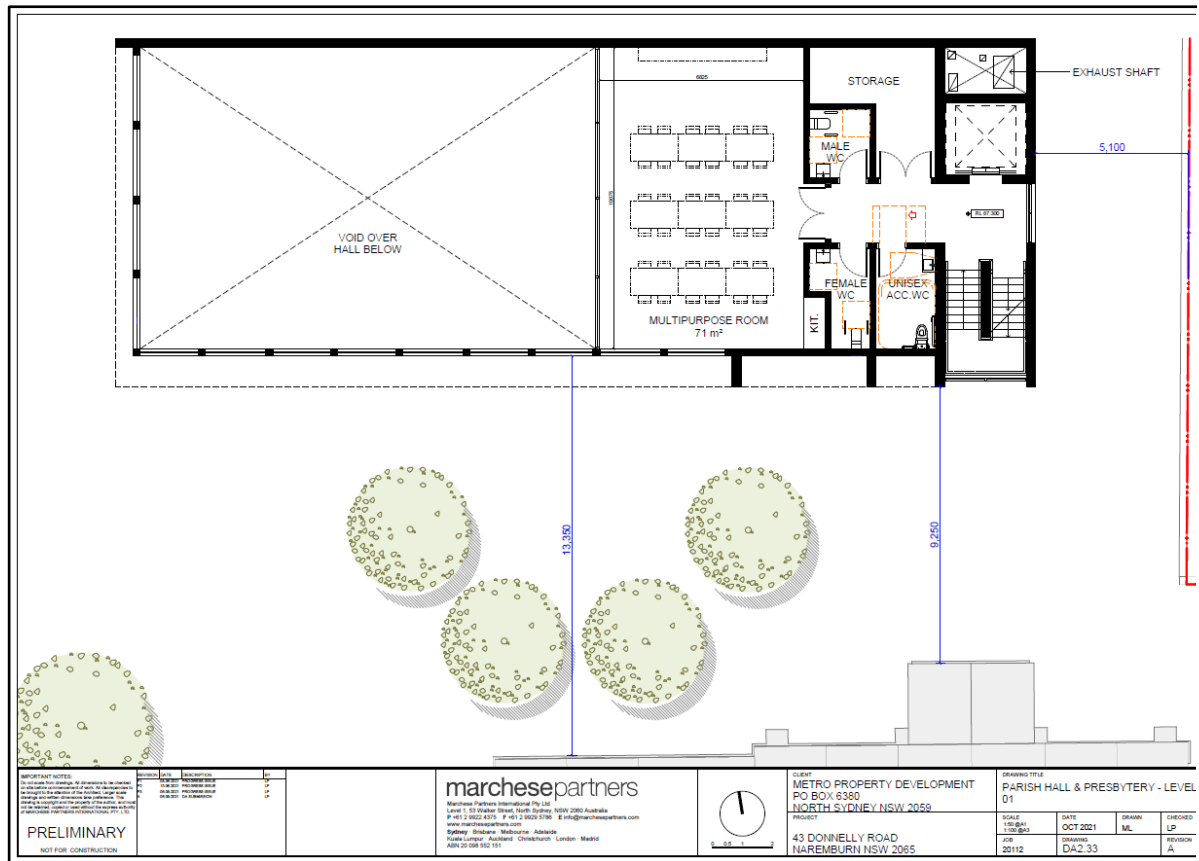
Proposed Level 01 plan of the new parish hall and presbytery.
